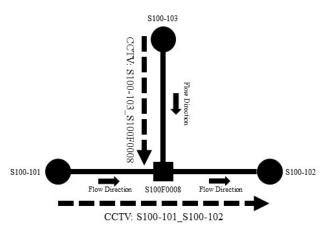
Performing Sewer Pipe Inspections
